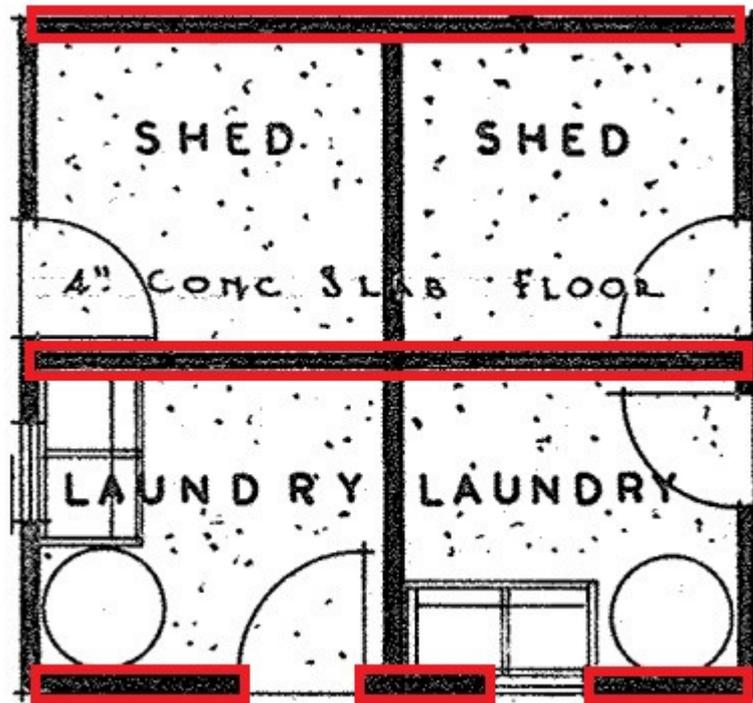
Walls used for bracing in the longitudinal direction laundry building.
